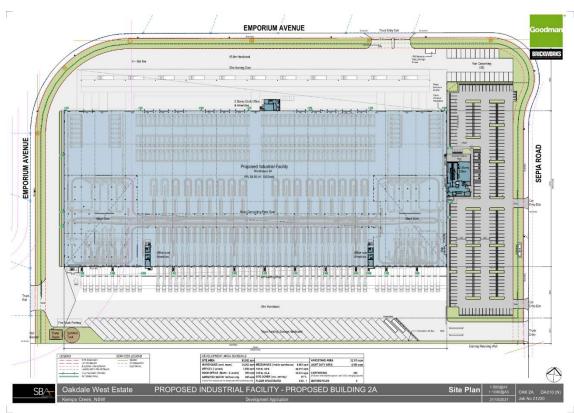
Amended site layout - Building 2A (Source: SBA Architects)
